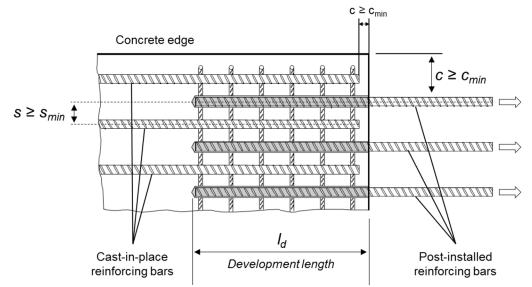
INSTALLATION PARAMETERS FOR POST-INSTALLED REINFORCING BARS
